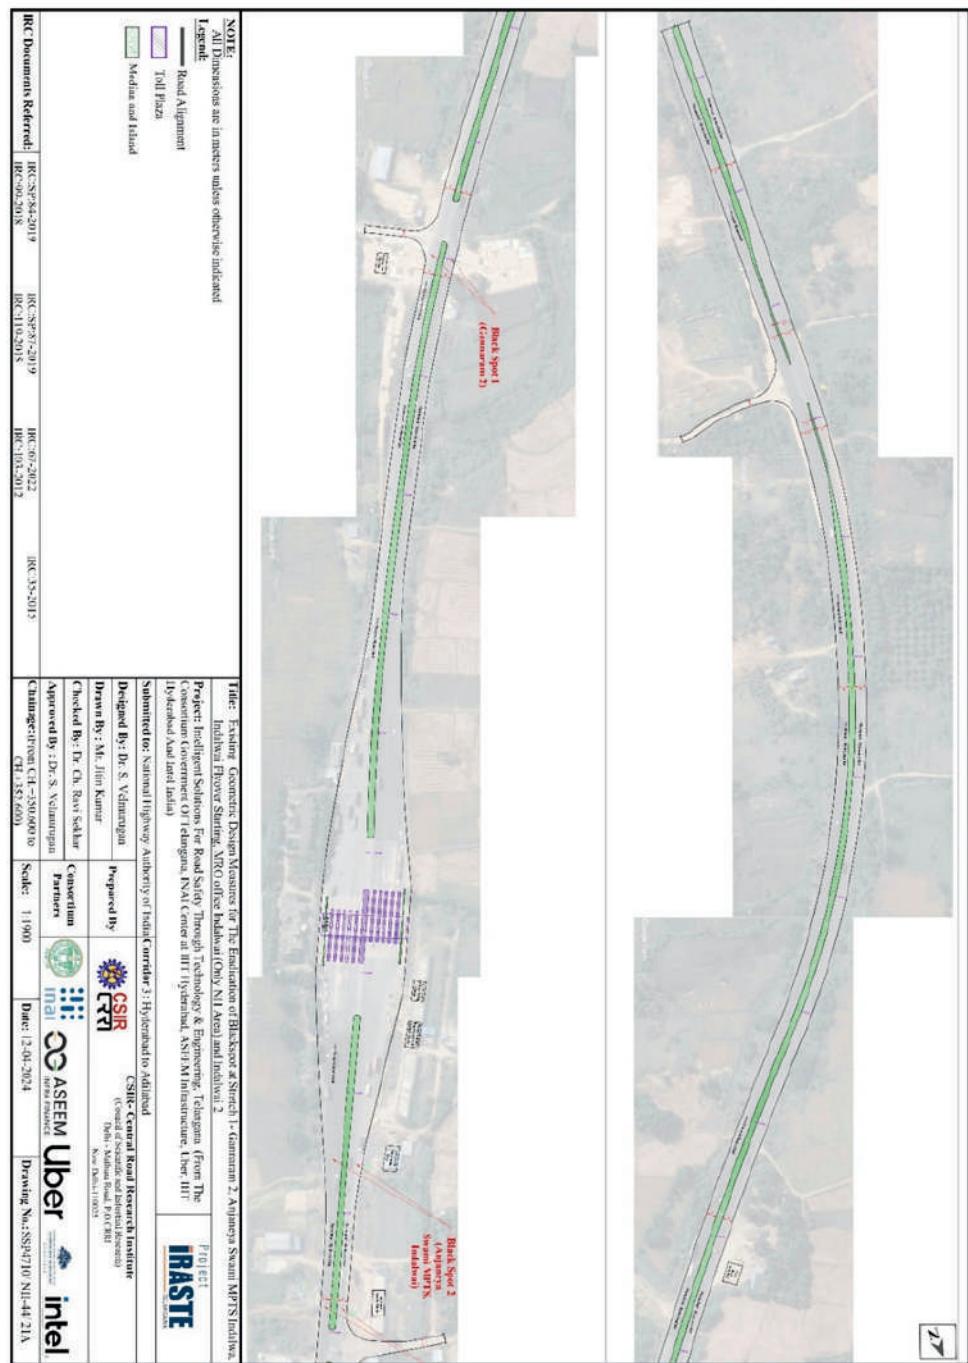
Existing Physical Survey Plan of Stretch 1A: Indalwai to Gannaram on NH-44
